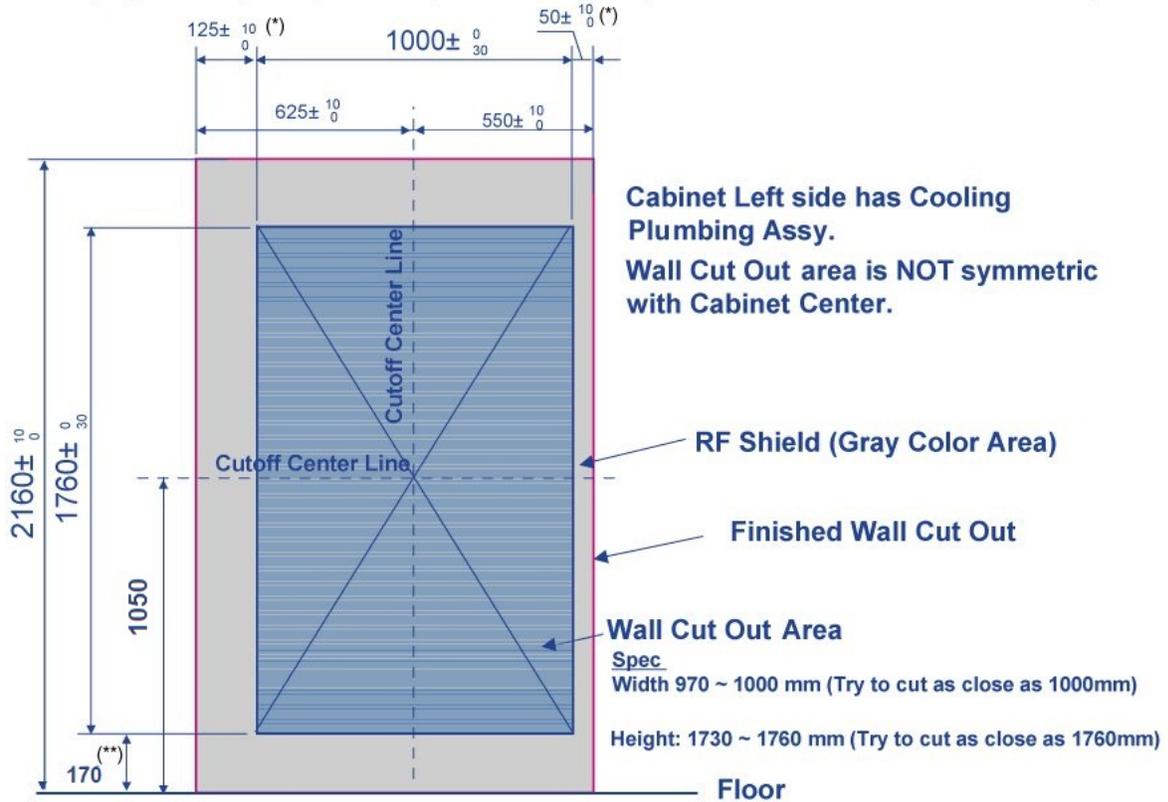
shows wall cutoff detail for System Cabinet (Equipment (or Operator) Room Side).
